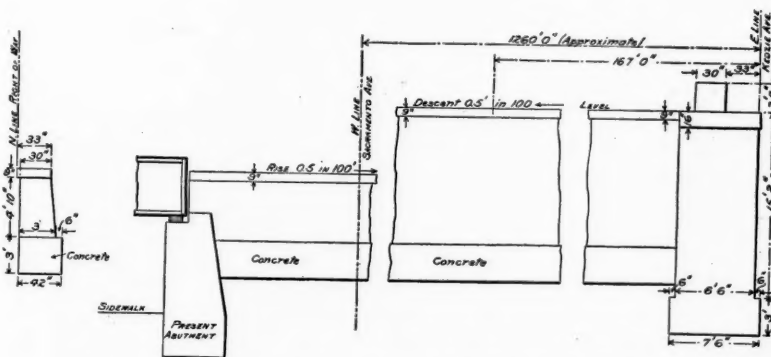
Retaining Wall between Kedzie and Sacramento Avenues—Chicago Track Elevation.
